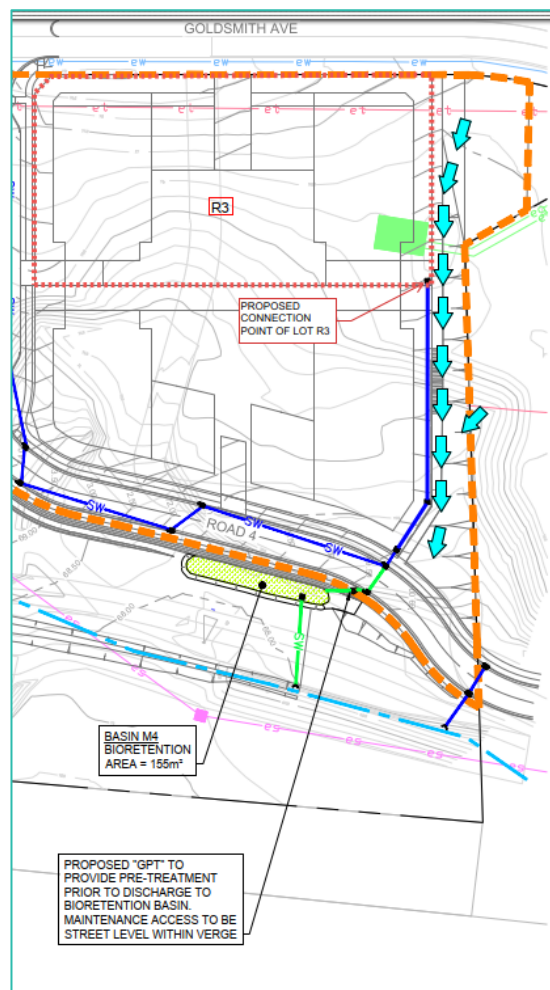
Constructed Precinct Stormwater Plan (IDC, 2021)
